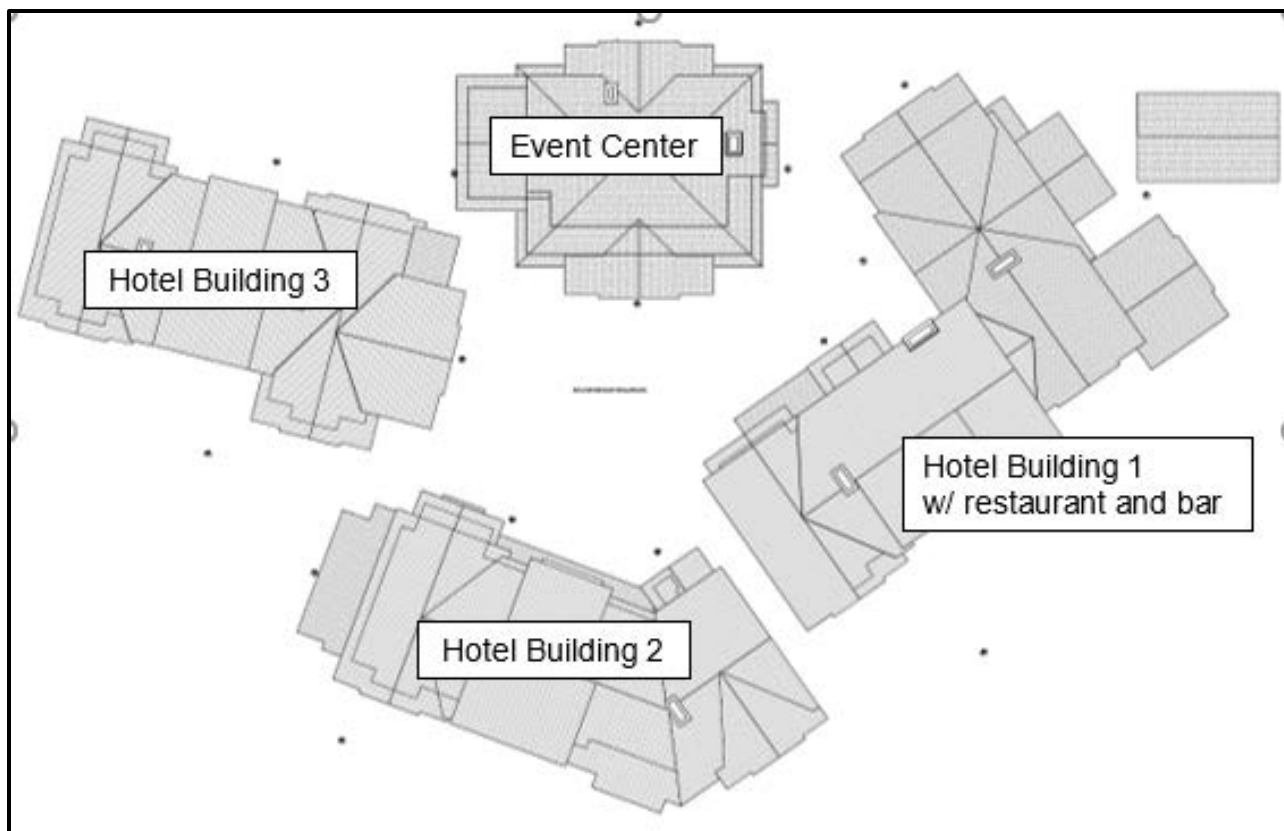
Roof Plan – Entitlement Set Sheet A4-1
